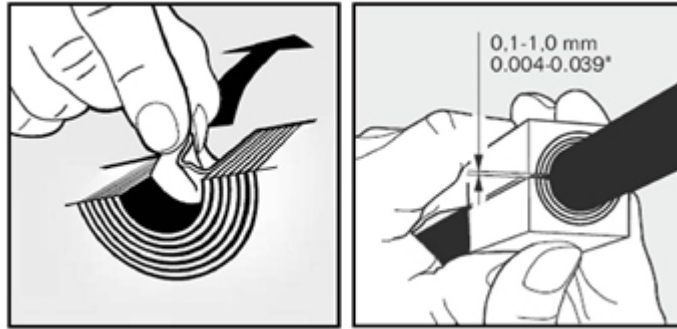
Adapting a Module to the Cable Size, Checking the Gap
